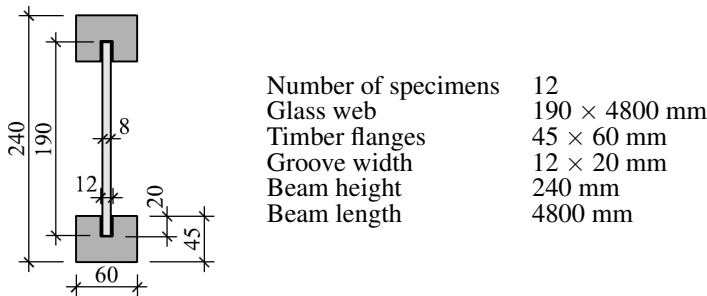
Cross-sections of the beam specimens; nominal dimensions.
